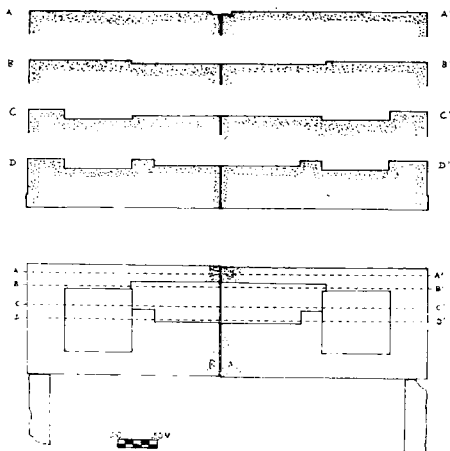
Plan and sections of limestone base, Karaburun II.
